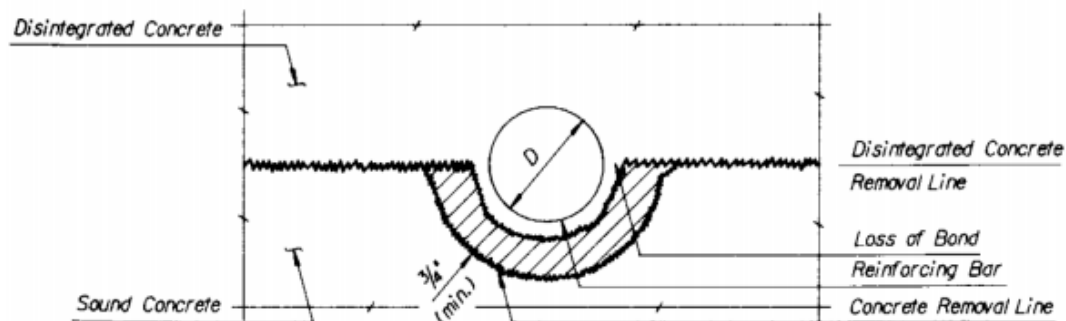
KDOT Plan for Removal of Concrete around Reinforcement with $< \frac{1}{2}$ Bar Exposed
